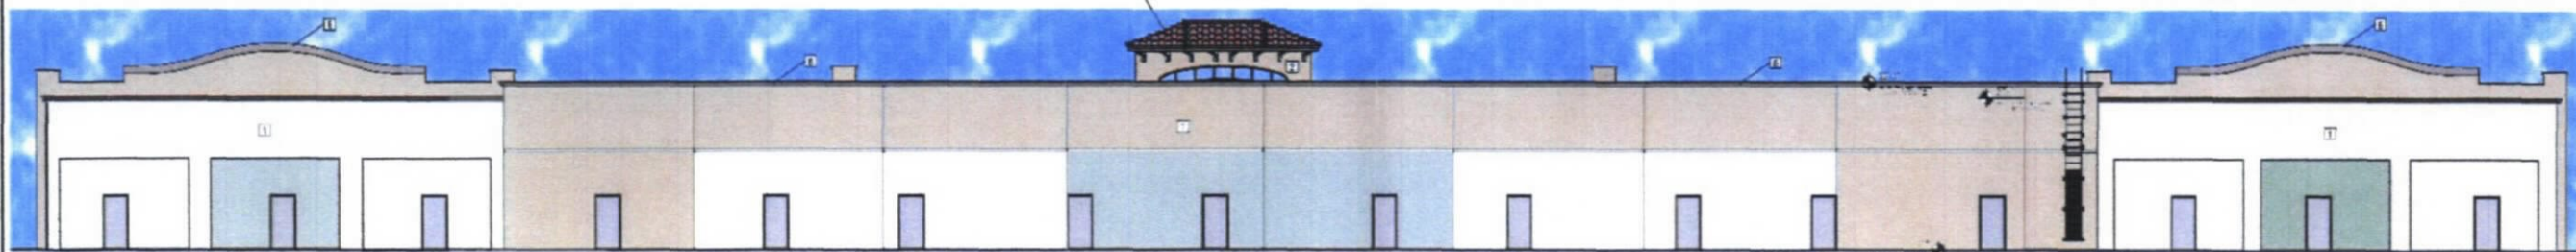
EXHIBIT D – CONCEPTUAL SHOPS ELEVATIONS
